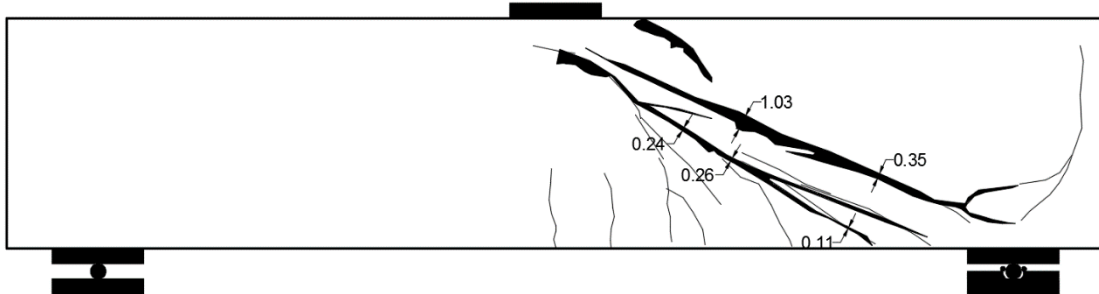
Crack pattern at failure for SNFRC 0.75% beam #23
